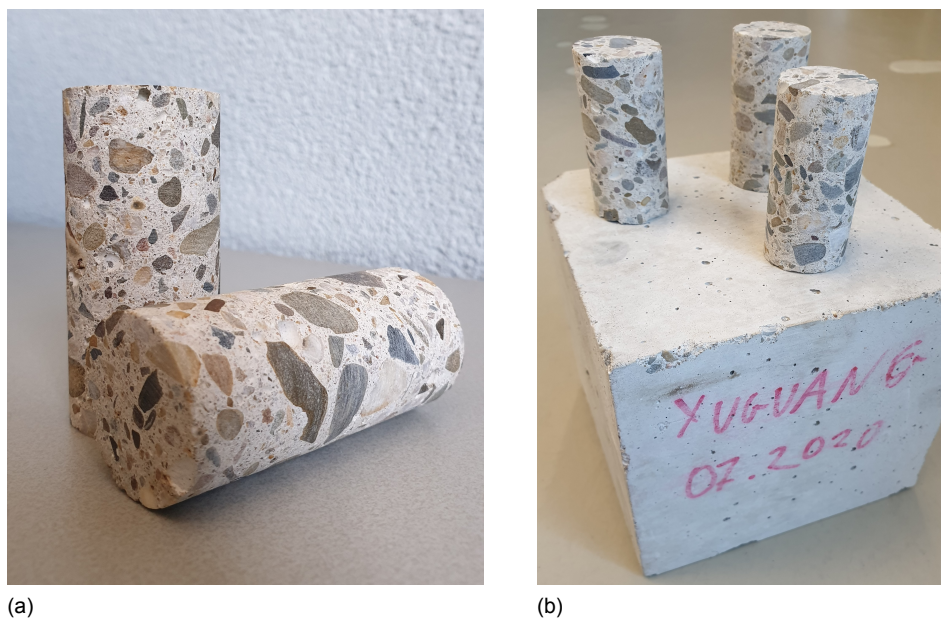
(a) Close-up of the new concrete core specimens. (b) New concrete core specimens with consistent dimensions.
